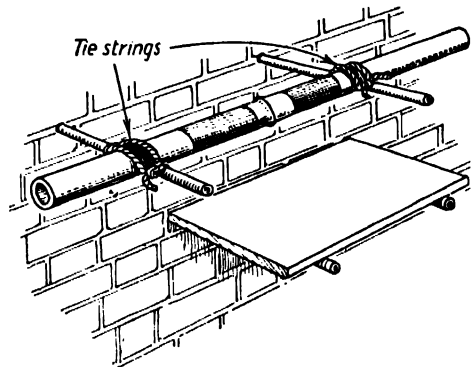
Use of fixing points for securing pipes when jointing, and to support platform for catching solder.
